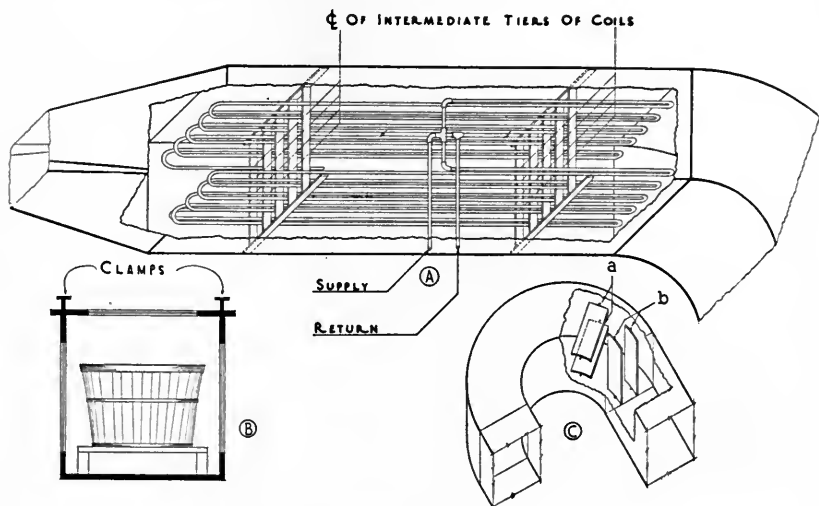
INTERIOR SECTIONS OF "TUNNEL"
